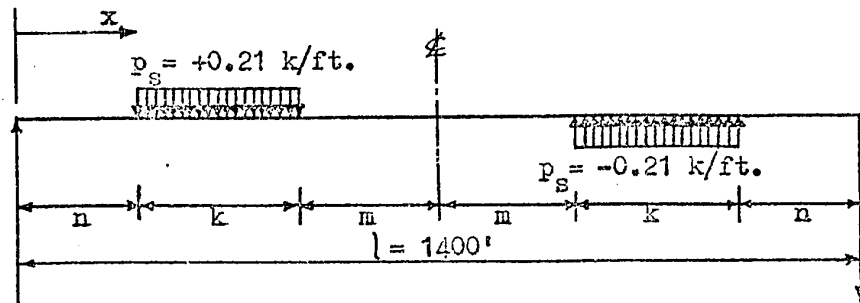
SIMPLE TRUSS SHEAR FOR ANTI - SYMMETRIC LOADING
